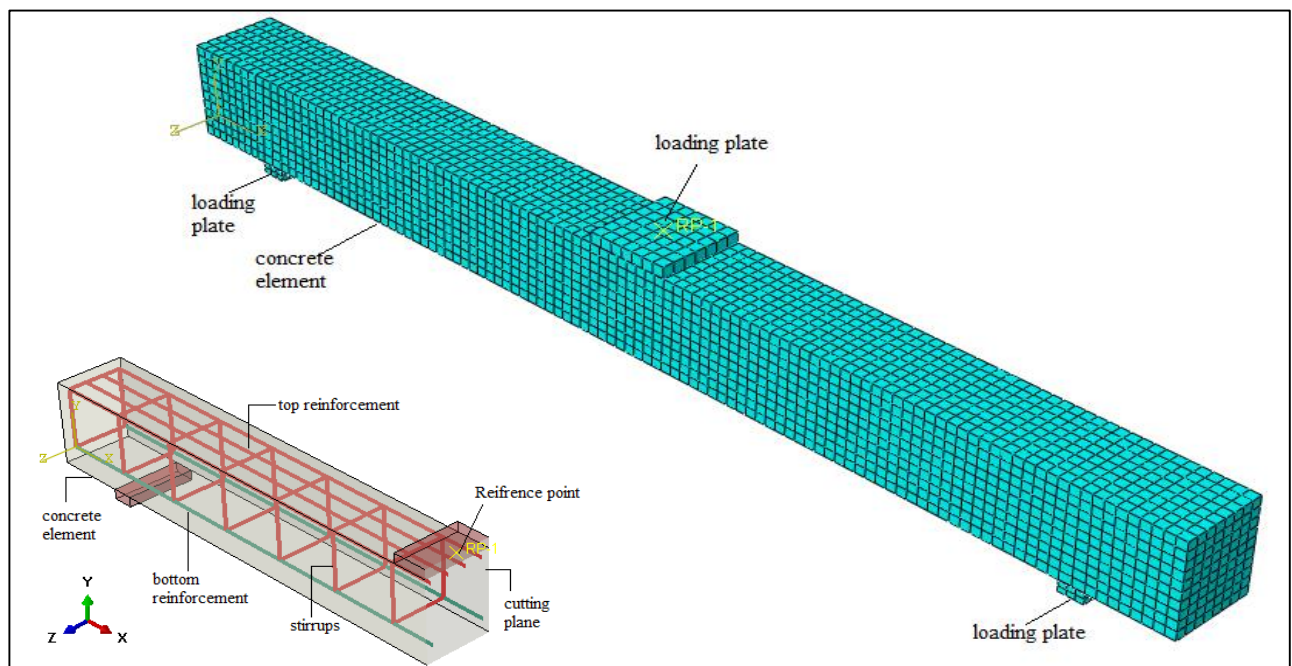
The typical figure of 3D FE mesh (concrete element steel and FRP reinforcement)
